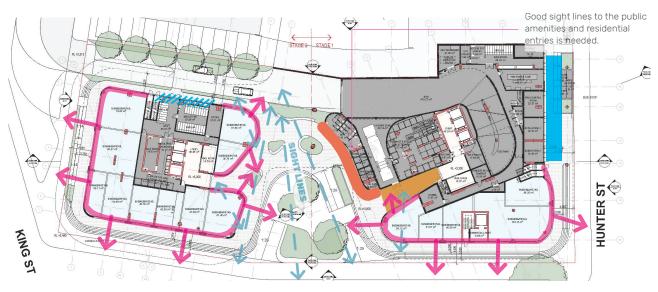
Ground floor plan highlighting surveillance considerations (Plus Architecture 2022). Pink arrows shows good surveillance. Blue dashed arrow show areas where landscape and internal fitouts need to protect sight lines, in particular to the residential entry and amenities (shown in orange).
